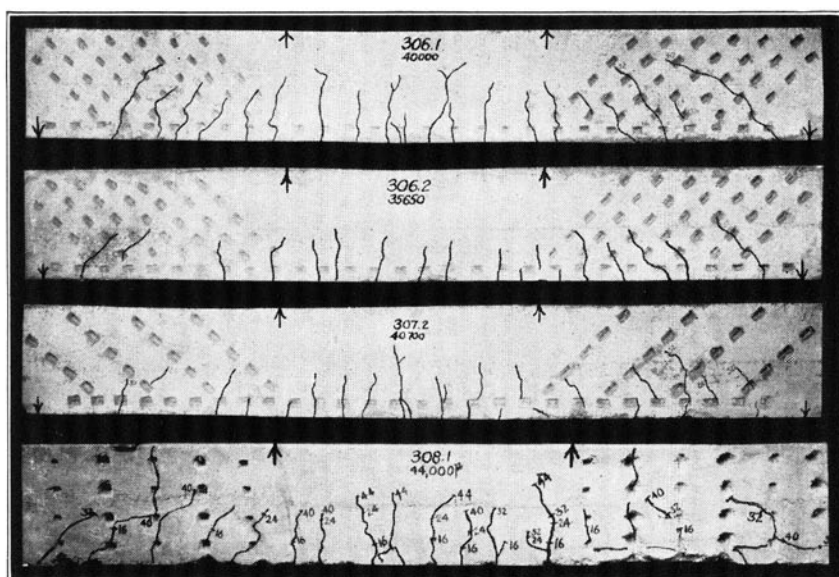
VIEWS OF BEAMS AFTER FAILURE, SERIES OF 1913
